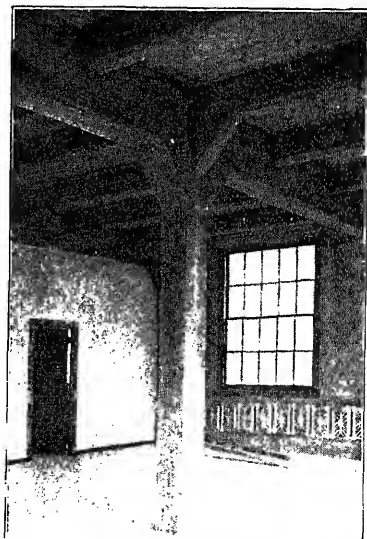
Floor Construction in Shop Building of Swarthmore (Pa.) College Showing Connection of Girder Beams with Column
